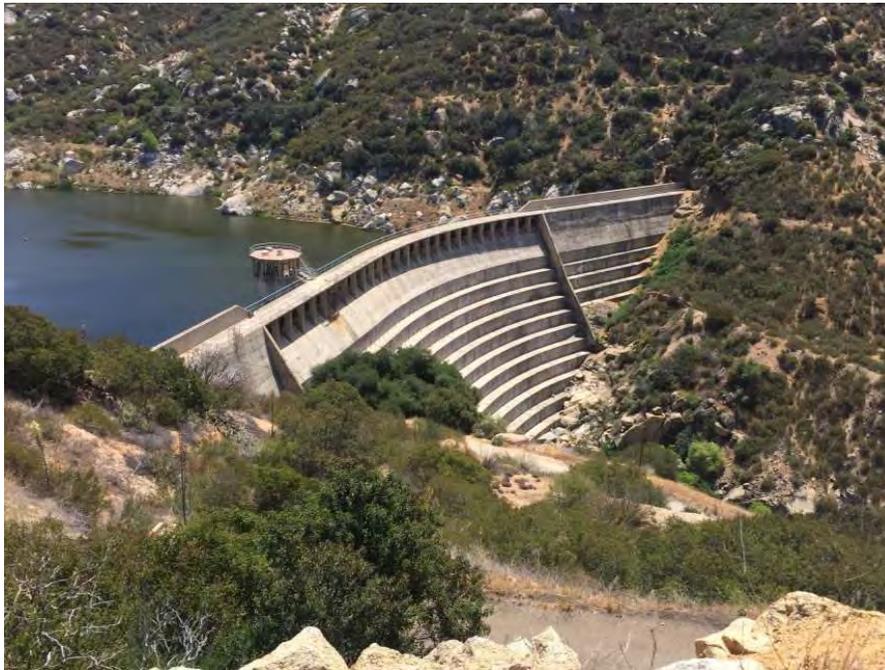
Overview of Barret Dam from western slope face, view looking northeast (IMG\_5947)
